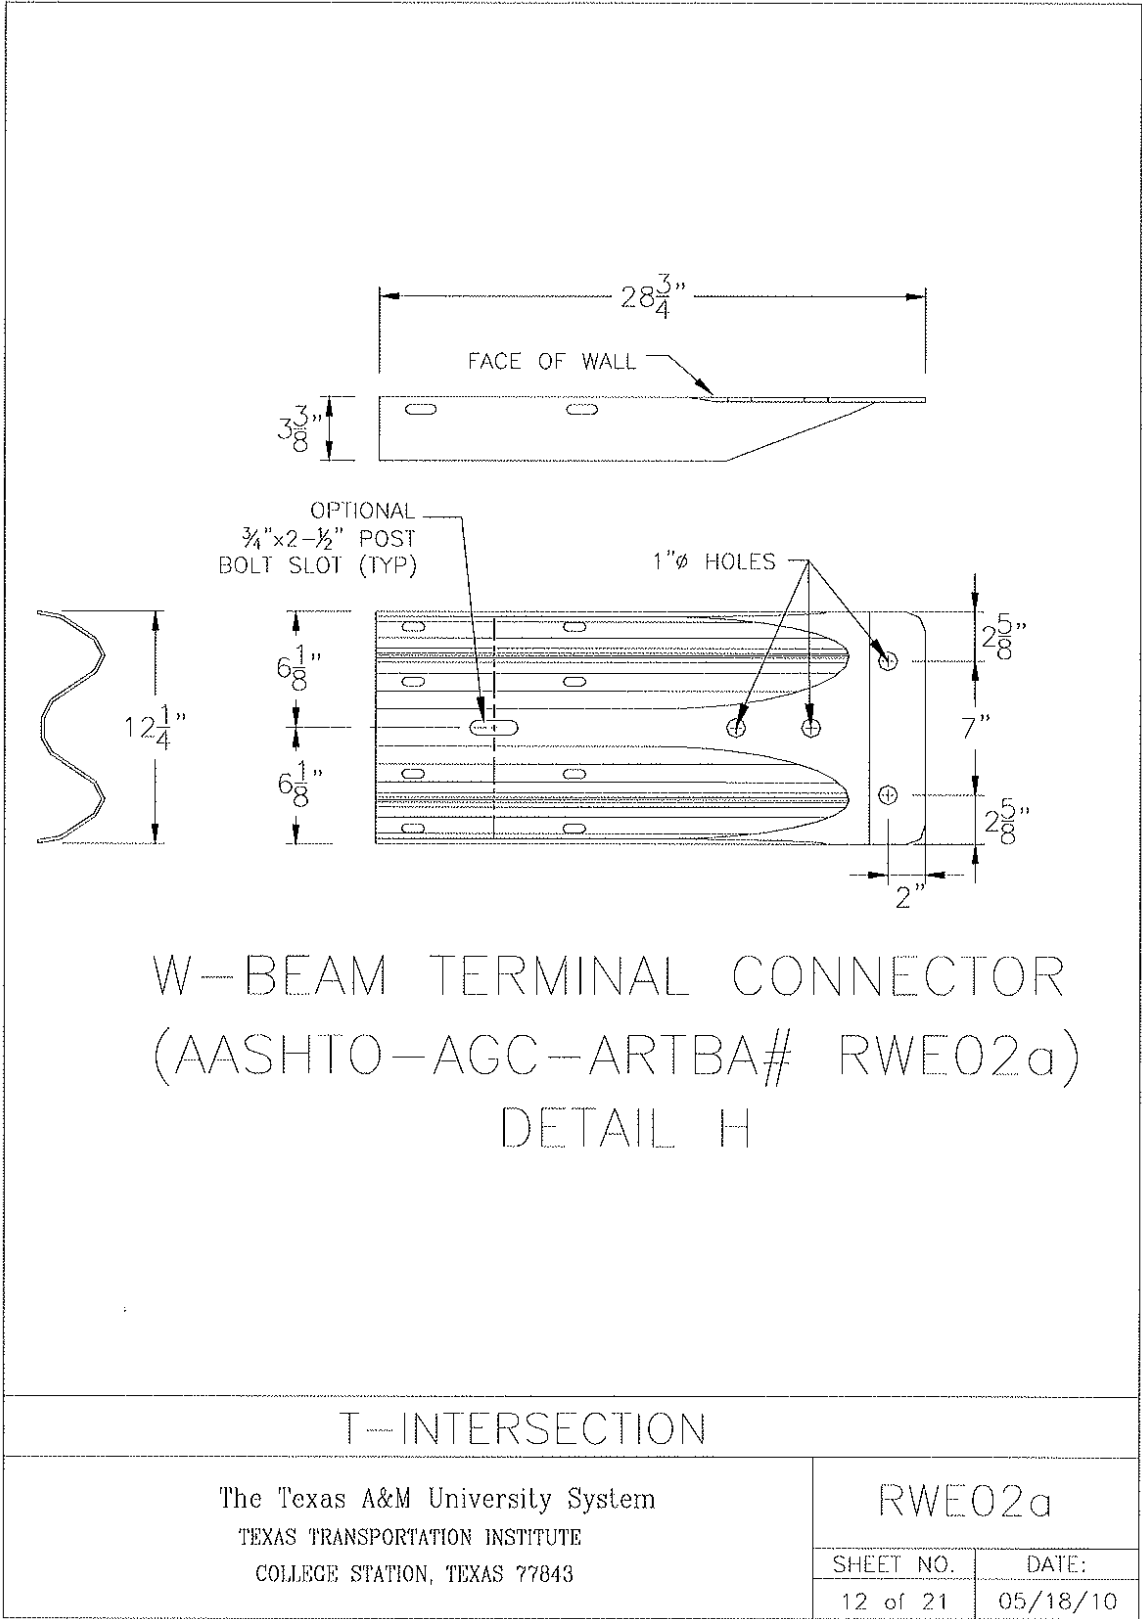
End Shoe Details for W-beam Connector to Concrete Barrier [27]
